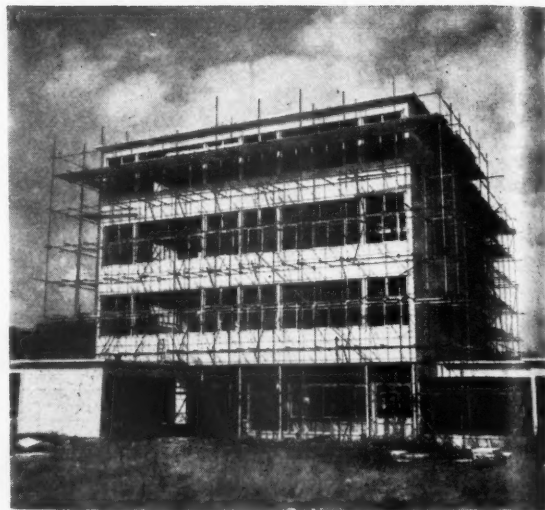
School at Wokingham. The concrete facing slabs fixed
